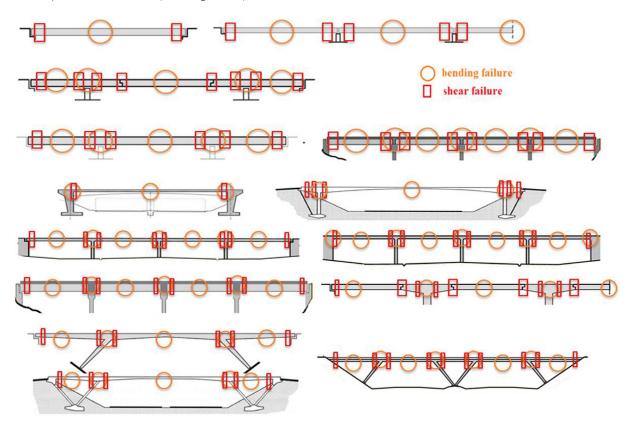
Vulnerable zones for different types of girder & frame bridges
